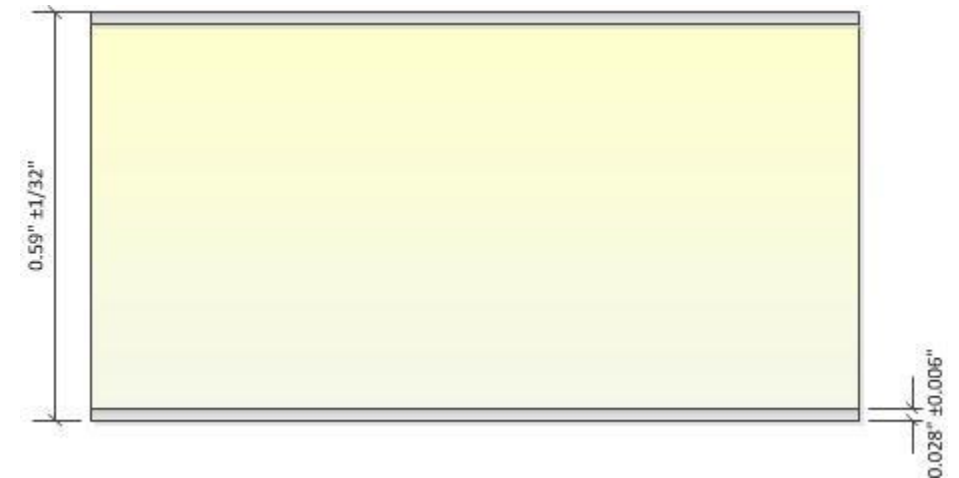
5/8-in. GoBoard® Thickness Dimensions
